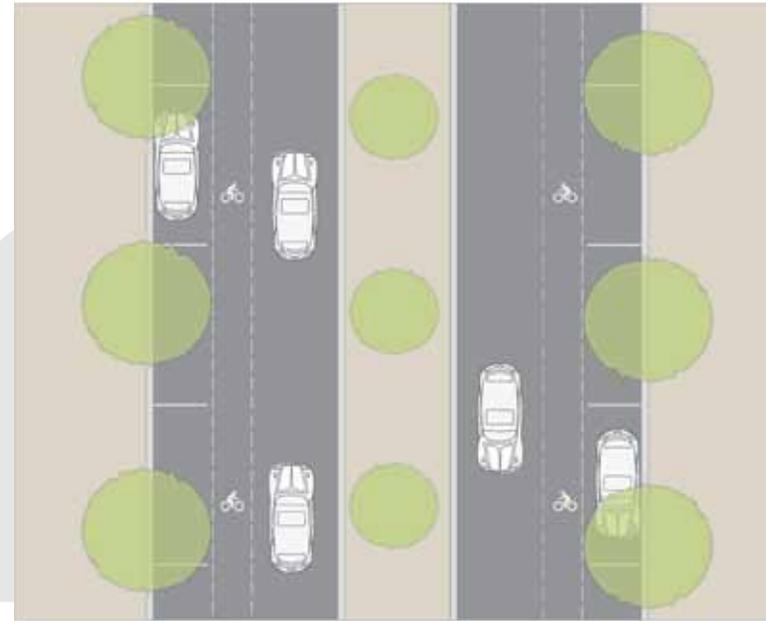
SUB-ARTERIAL ROAD CROSS-SECTION
